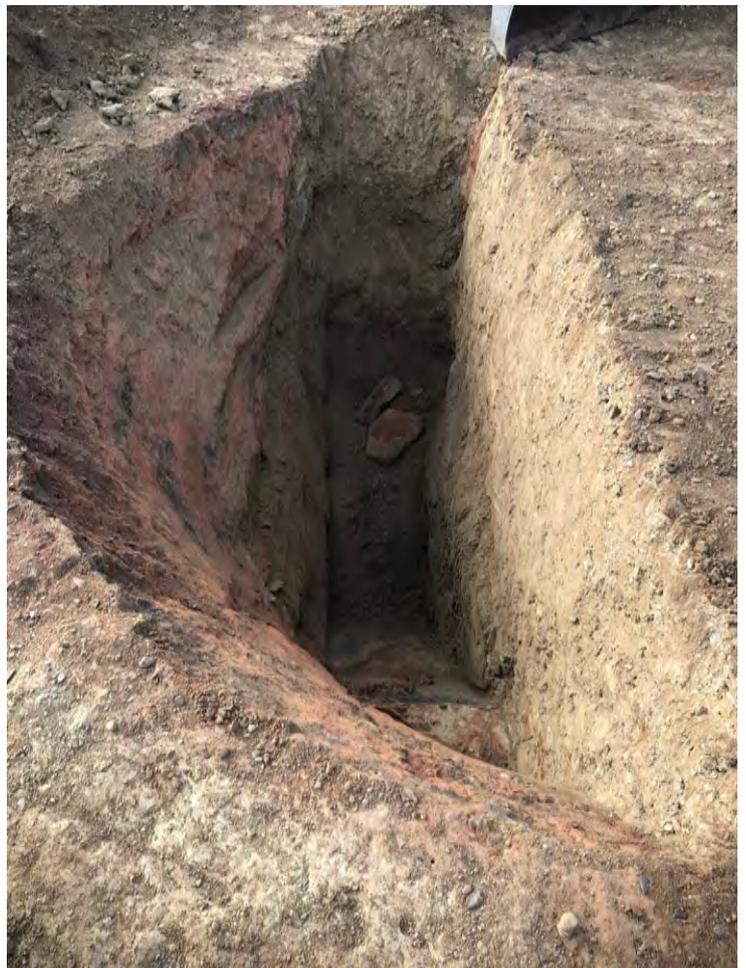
View to the north-west of feature [5003] at 4m below the ground level (not fully excavated)
